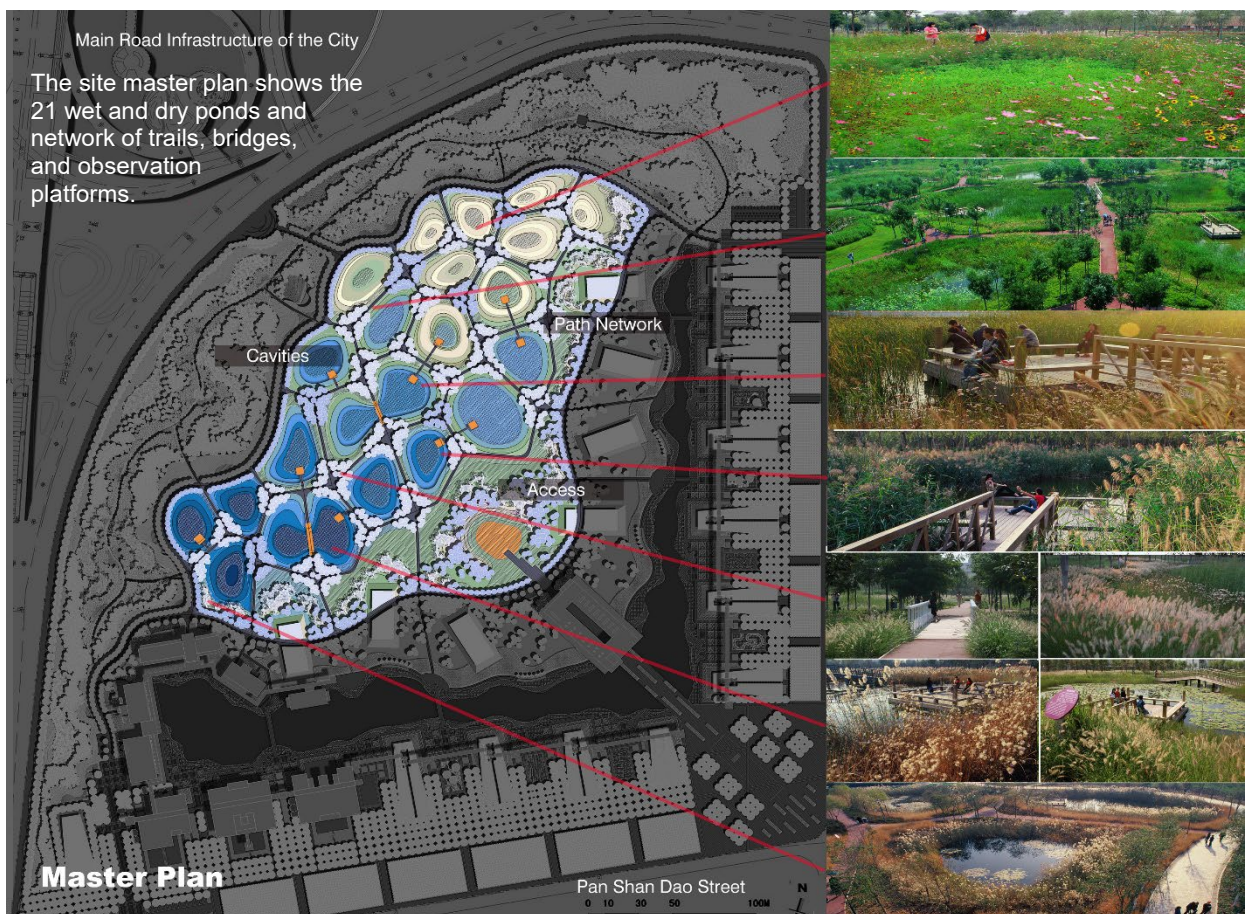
Park's Site Plan for the various ponds, Source: Turenscape, 2009
